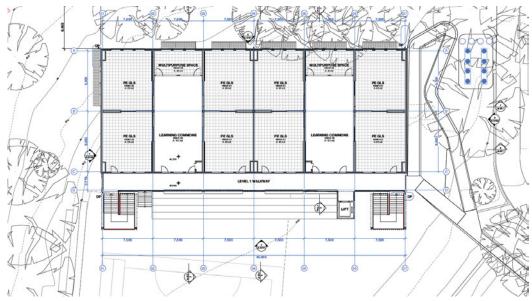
Proposed first floor layout. Source: Bennett and Trimble. 2022
